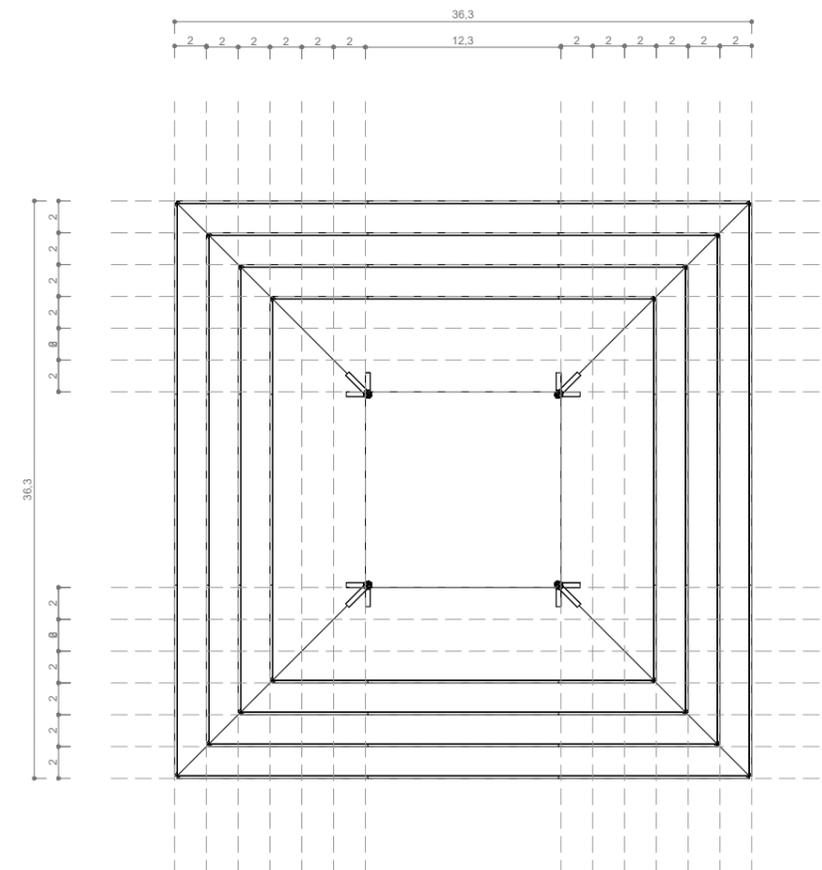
Prototype 2 – Steel Tower typology: Grid plan
